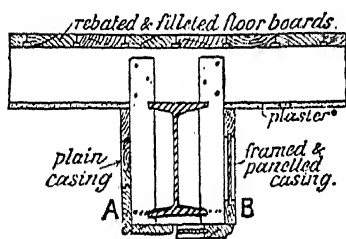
Alternative Methods of Encasing Iron Girders.
